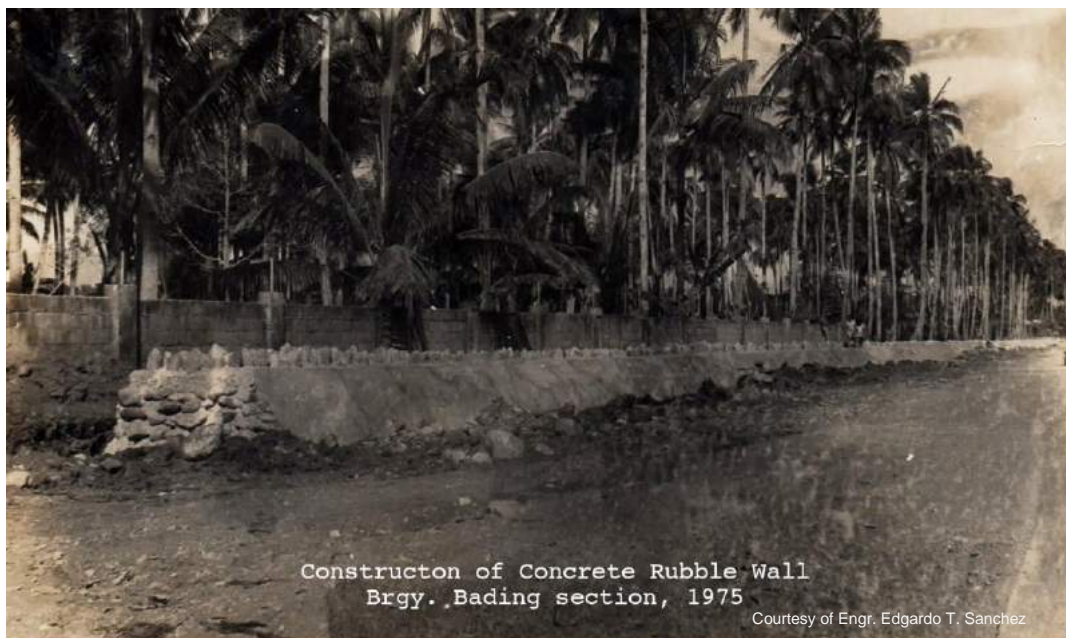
Concrete Rubble Wall, an early attempt at protecting the city from floods due to river overflows.
